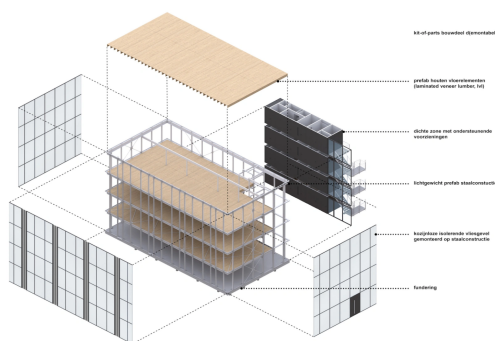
Building D(emountable); building designed to be disassembled (cepezed, 2019)
